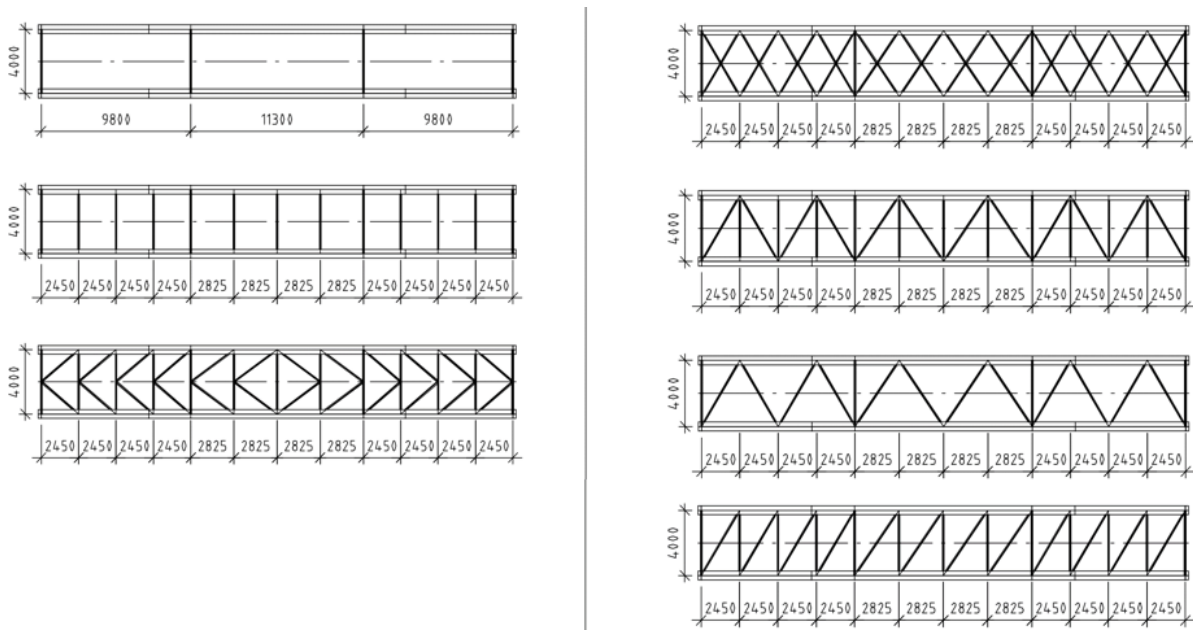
Layout and shapes of the original design and the six different bracing systems
